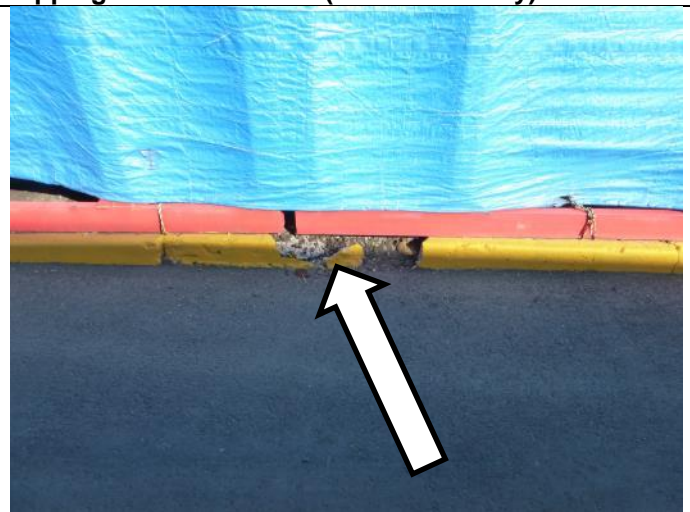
Damaged curbing east side of Cooling Towers (New Deficiency)
